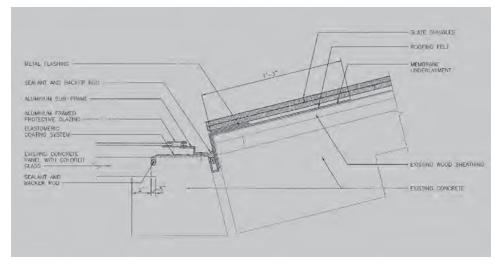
2005 Aluminum Protective Glazing Construction Detail. Hoffmann Architects, "Building Envelope Rehabilitation: First Presbyterian Church," July 11, 2005, 2/A6. Detail is for typical protective glazing at dalle de verre above roofline. All protective glazing at skyward facing panels was scheduled for replacement. The detail does not show ventilation. Direct access was not available to confirm whether the installed protective glazing was built as shown in this detail.
